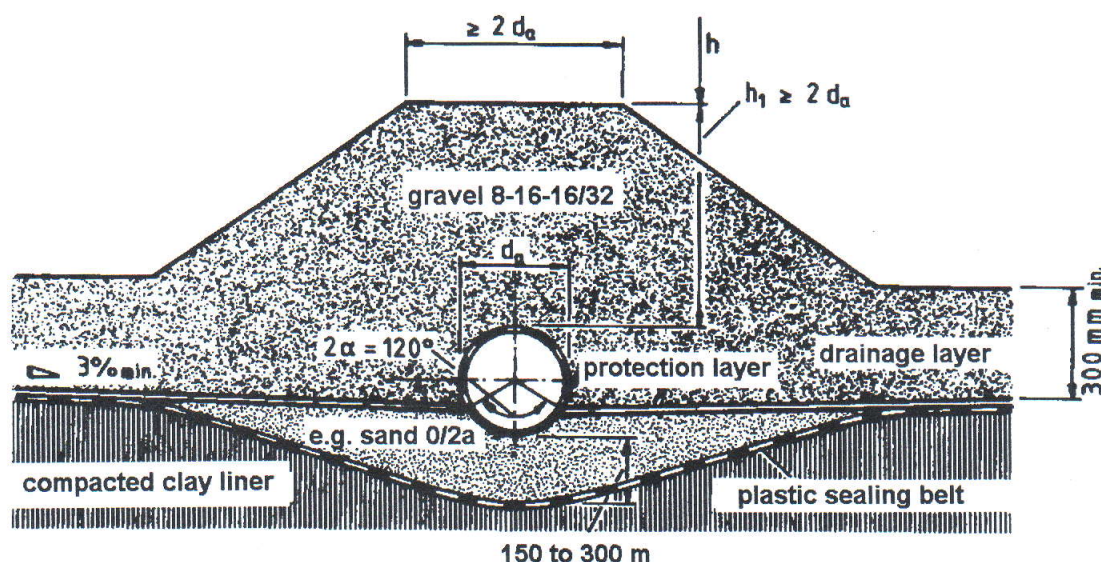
Cross section of construction, leachate collection pipe zone, according to DIN 19 667.
